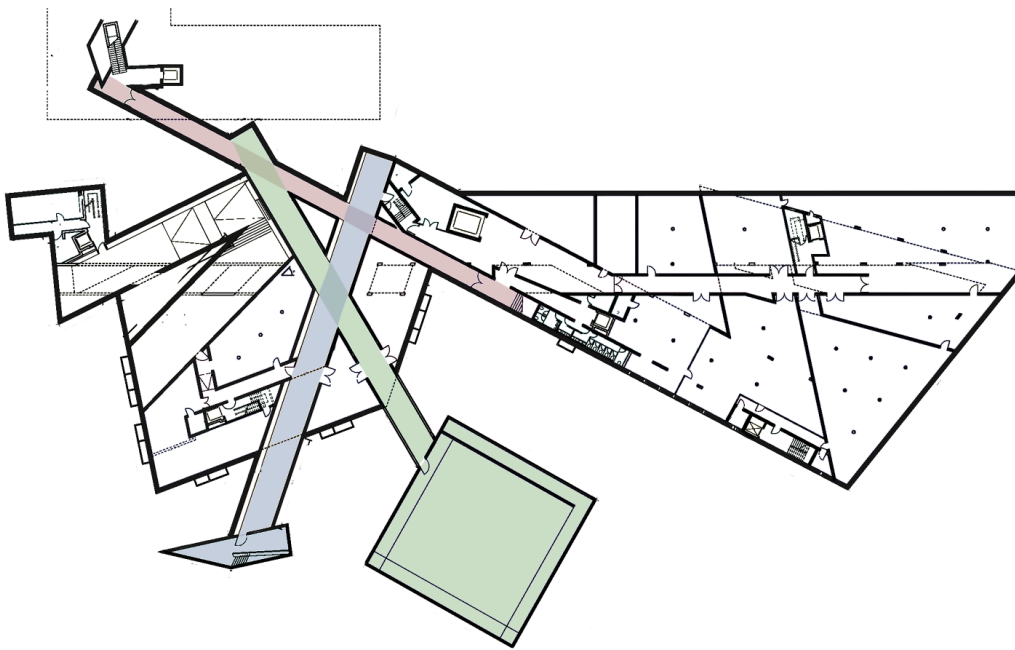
Three axes (*Floorplan Underground Floor, 2015*)
